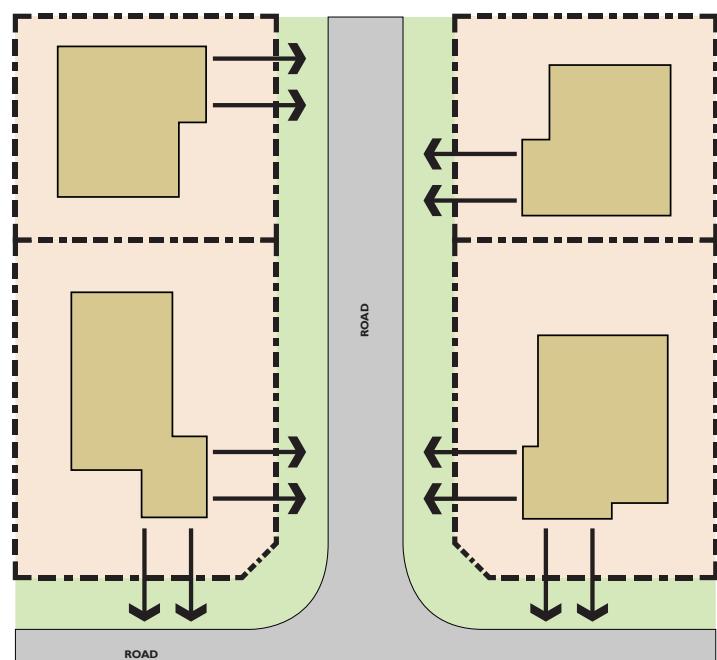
BUILDING ORIENTATION DIAGRAM
